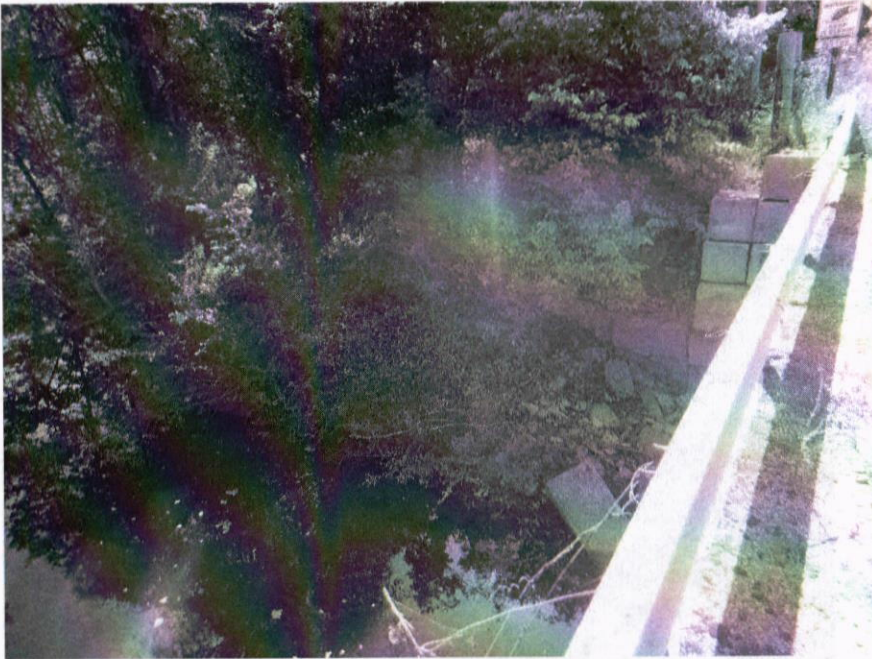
Facing southeast from the bridge over Bull Fork Salt Creek.
